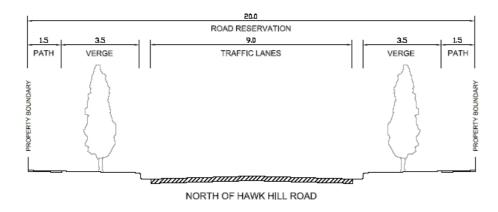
(b) Port Sorell and Environs Street Cross-section designs - North of Hawk Hill Road
